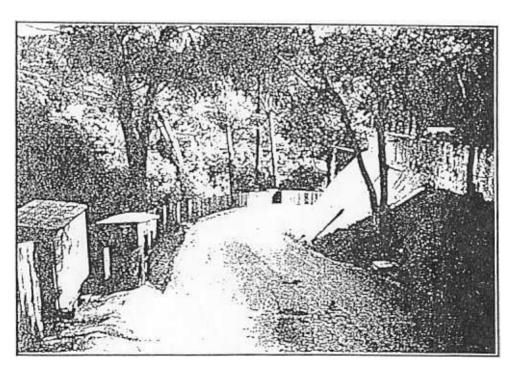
The Topanga Pipeline Investigation. View to the south-southeast from UTM location Zone 11, 353066 meters Easting, 3775045 meters Northing showing concrete retaining wall and redwood fence adjacent to Hillside Drive.
